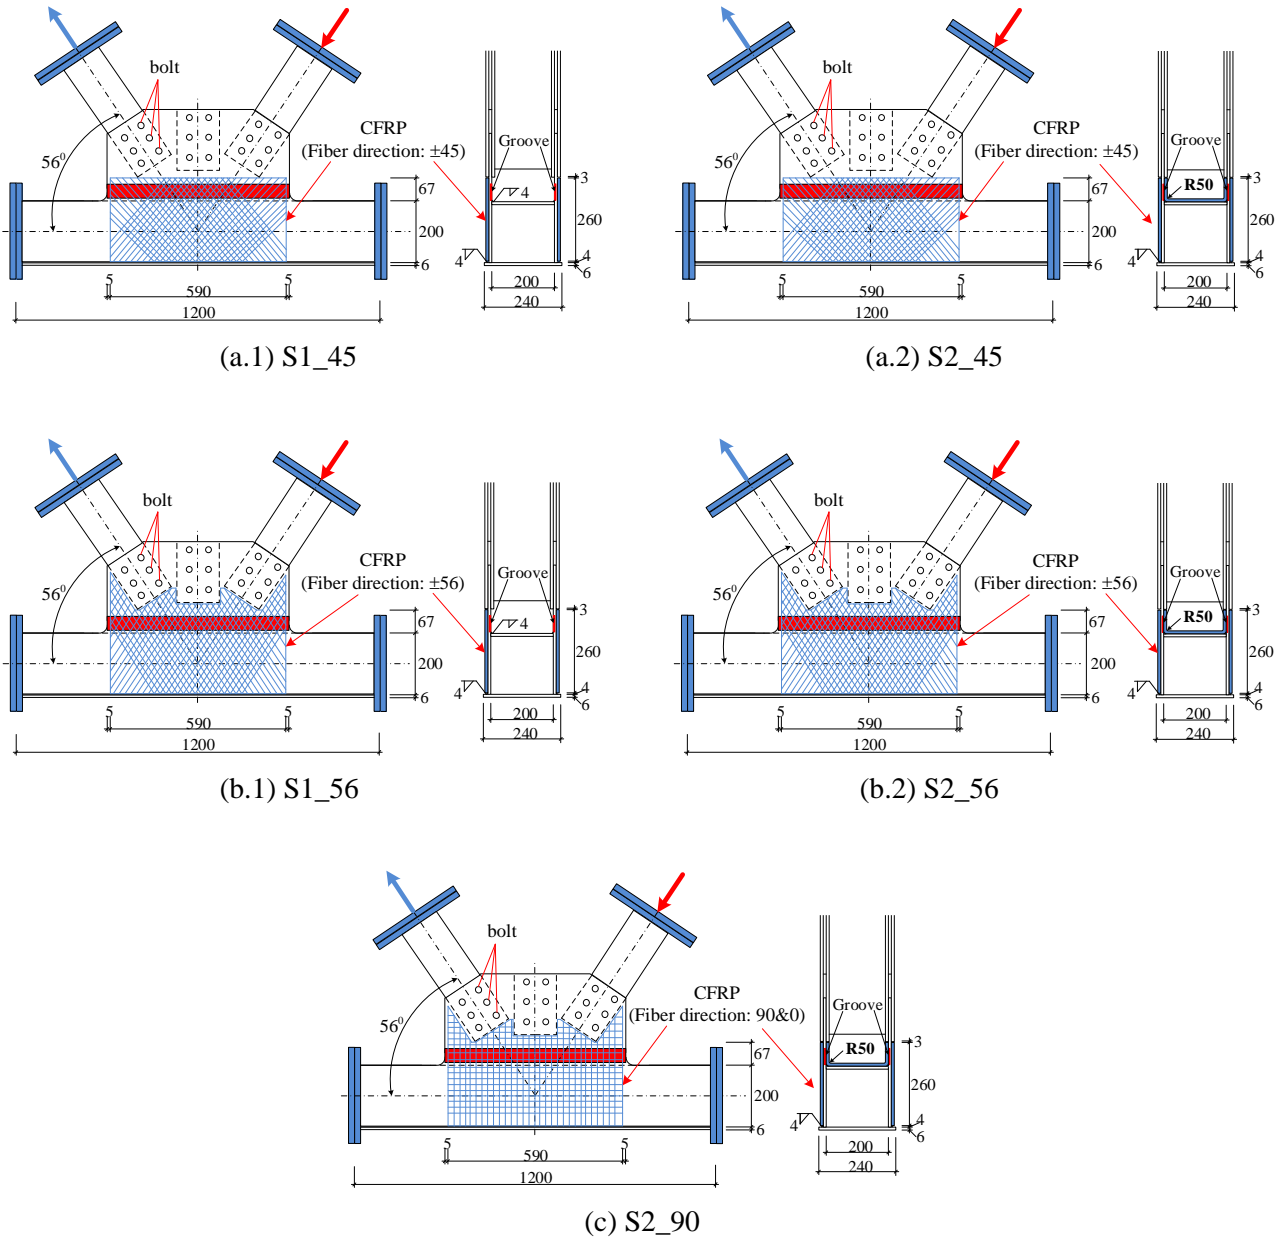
The CFRP bonding methods on the corroded gusset plate.
